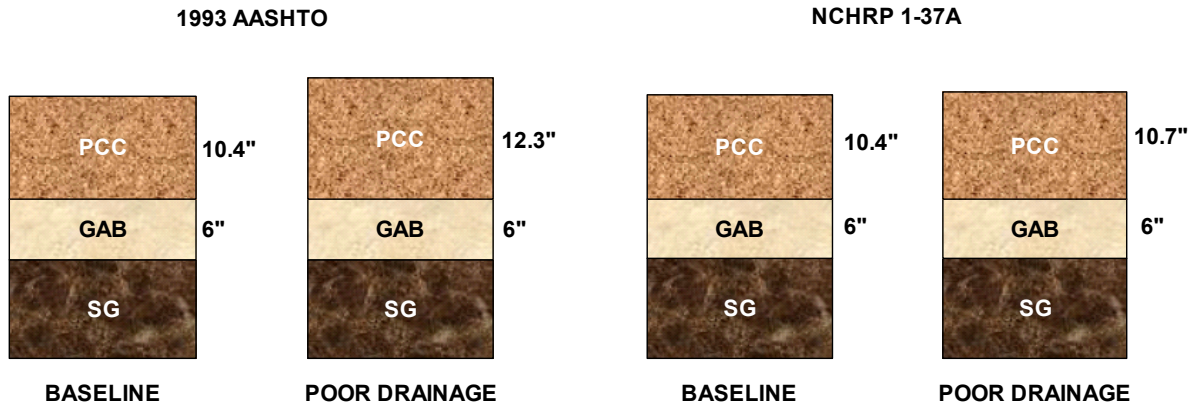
Summary of rigid pavement sections: poor drainage scenario.
